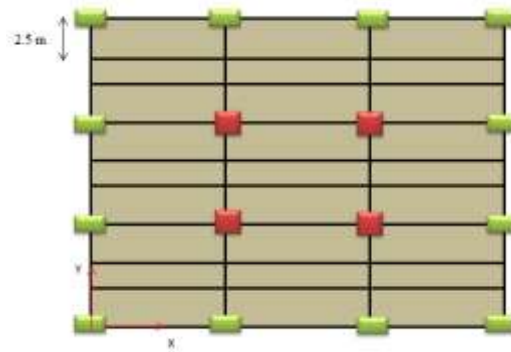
Models I - Slab with Main and Secondary Beam at Spacing 2.5 m
